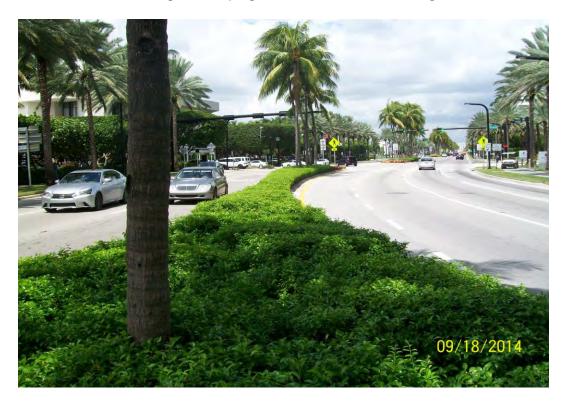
Center median landscaping adjacent to The Shops, looking north.
